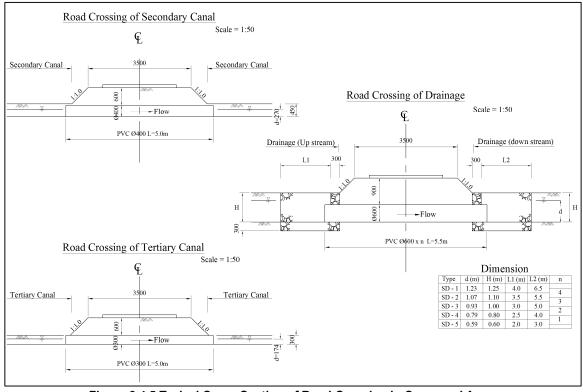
Typical Cross Section of Road Crossing in Command Area
